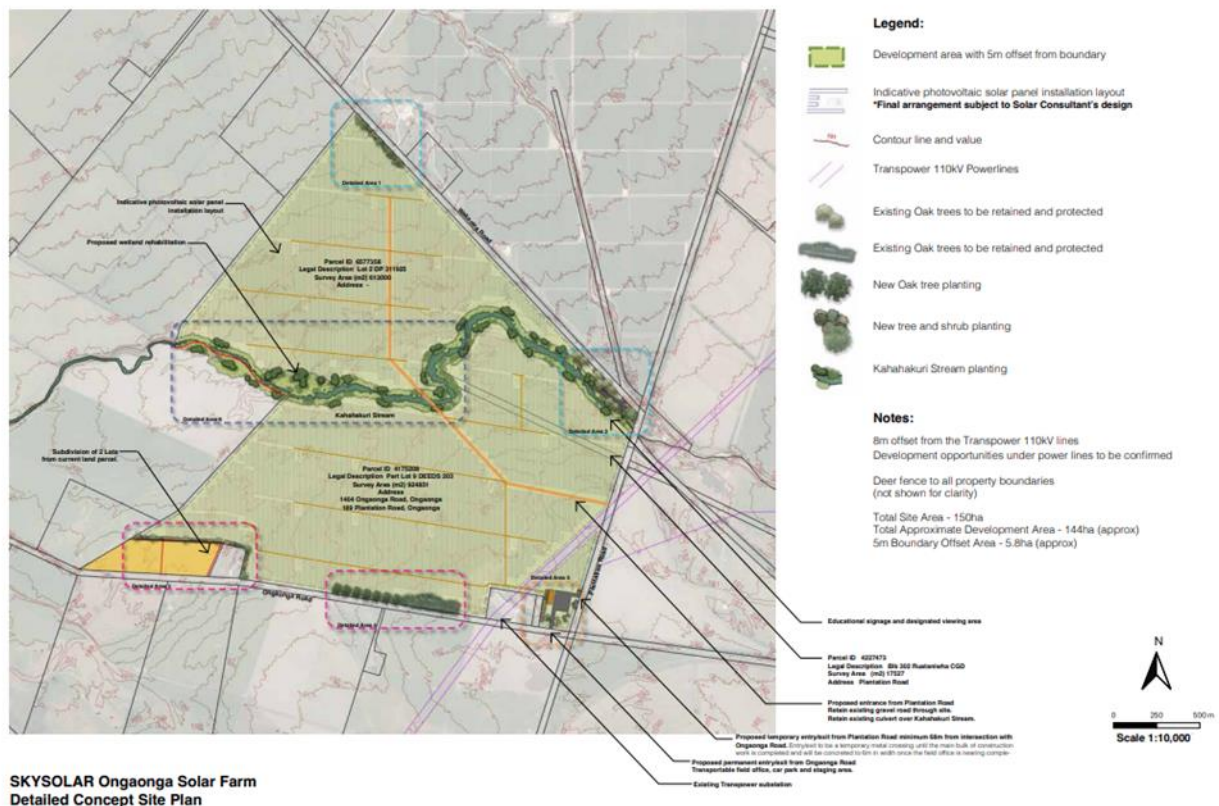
Site layout plan (Source: Wayfinder, Detailed Concept 2022)
